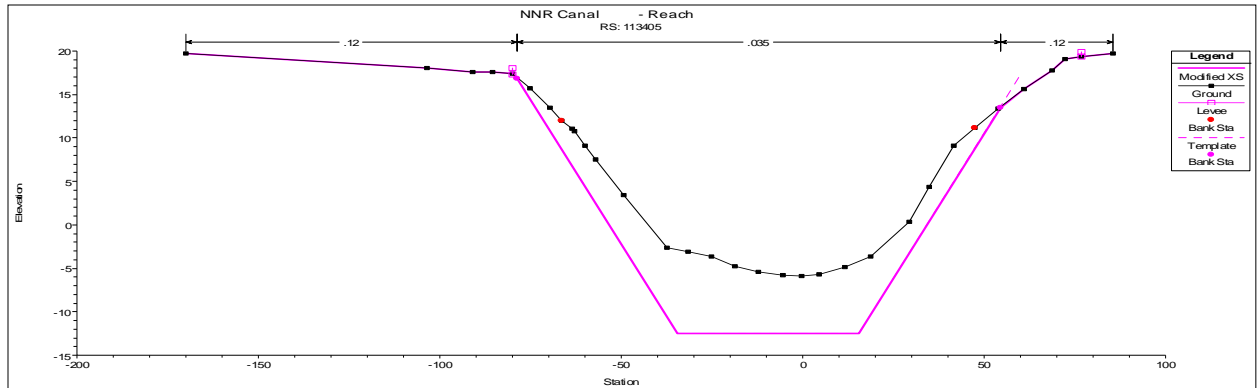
TYPICAL CROSS SECTION OF IMPROVEMENT (ELEVATIONS IN NGVD)
